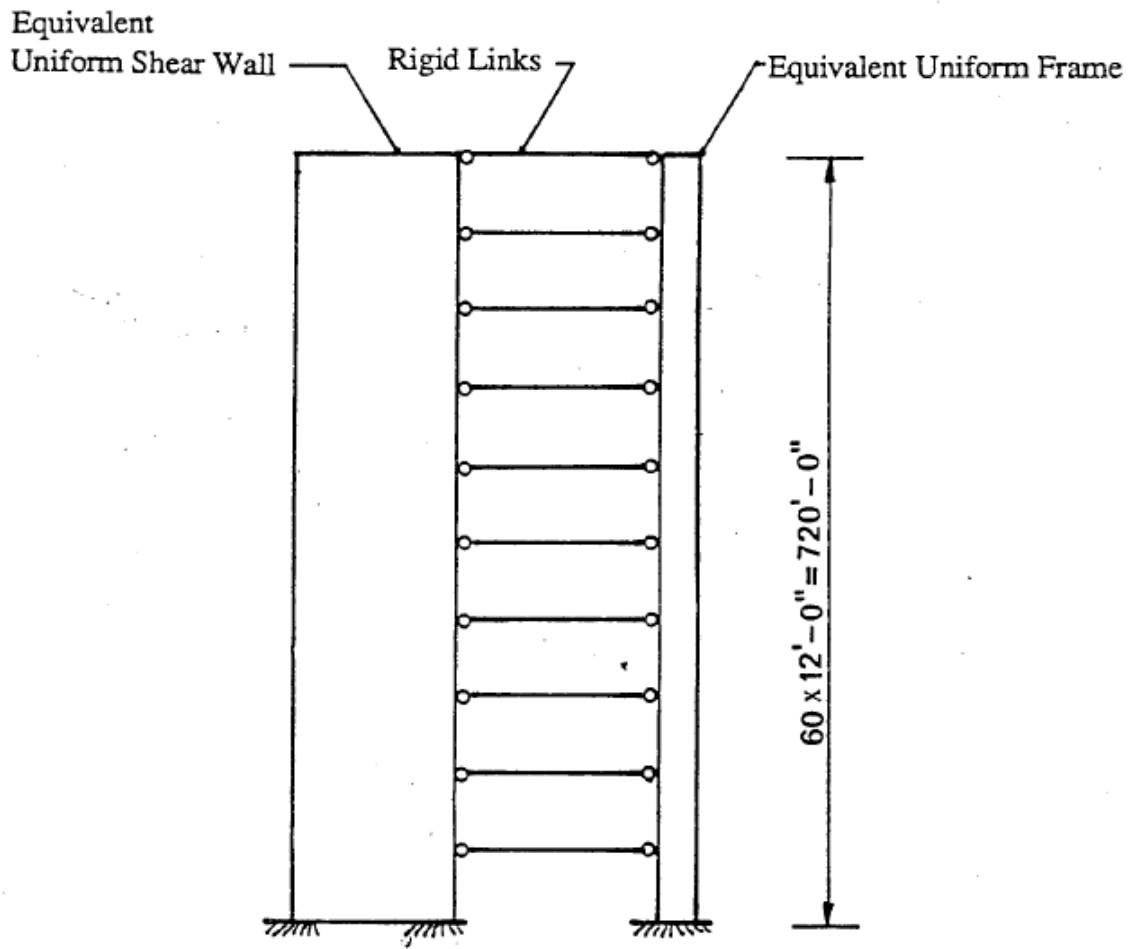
Wall\_Frame\_2D Model Example 2-2 and 2-3
